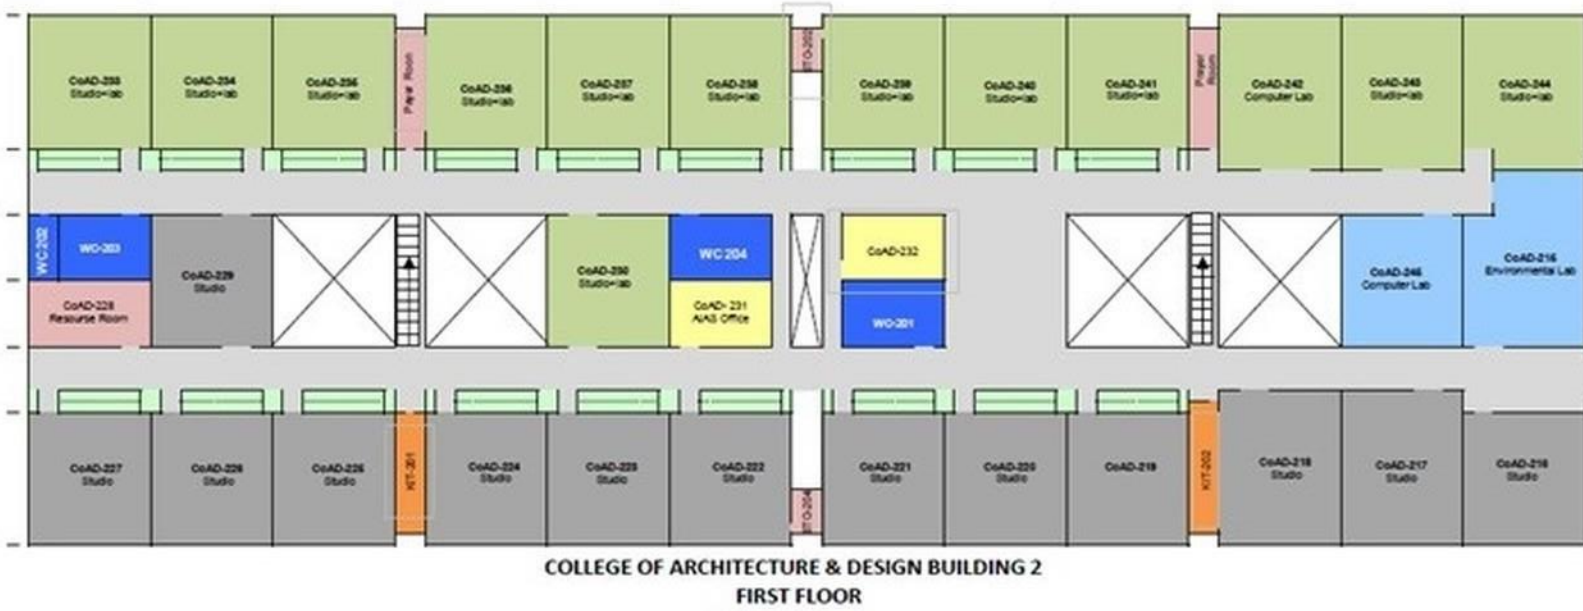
College of Architecture & Design: Second Floor Plan- Building 2 (not to scale)
